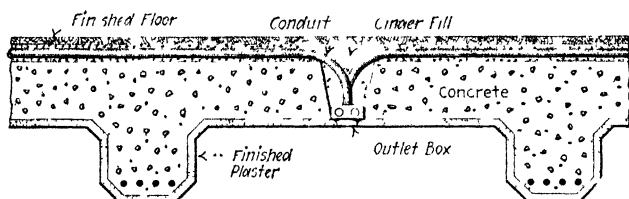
Final position of conduit and outlet box in hole provided as shown in Fig. 299.
